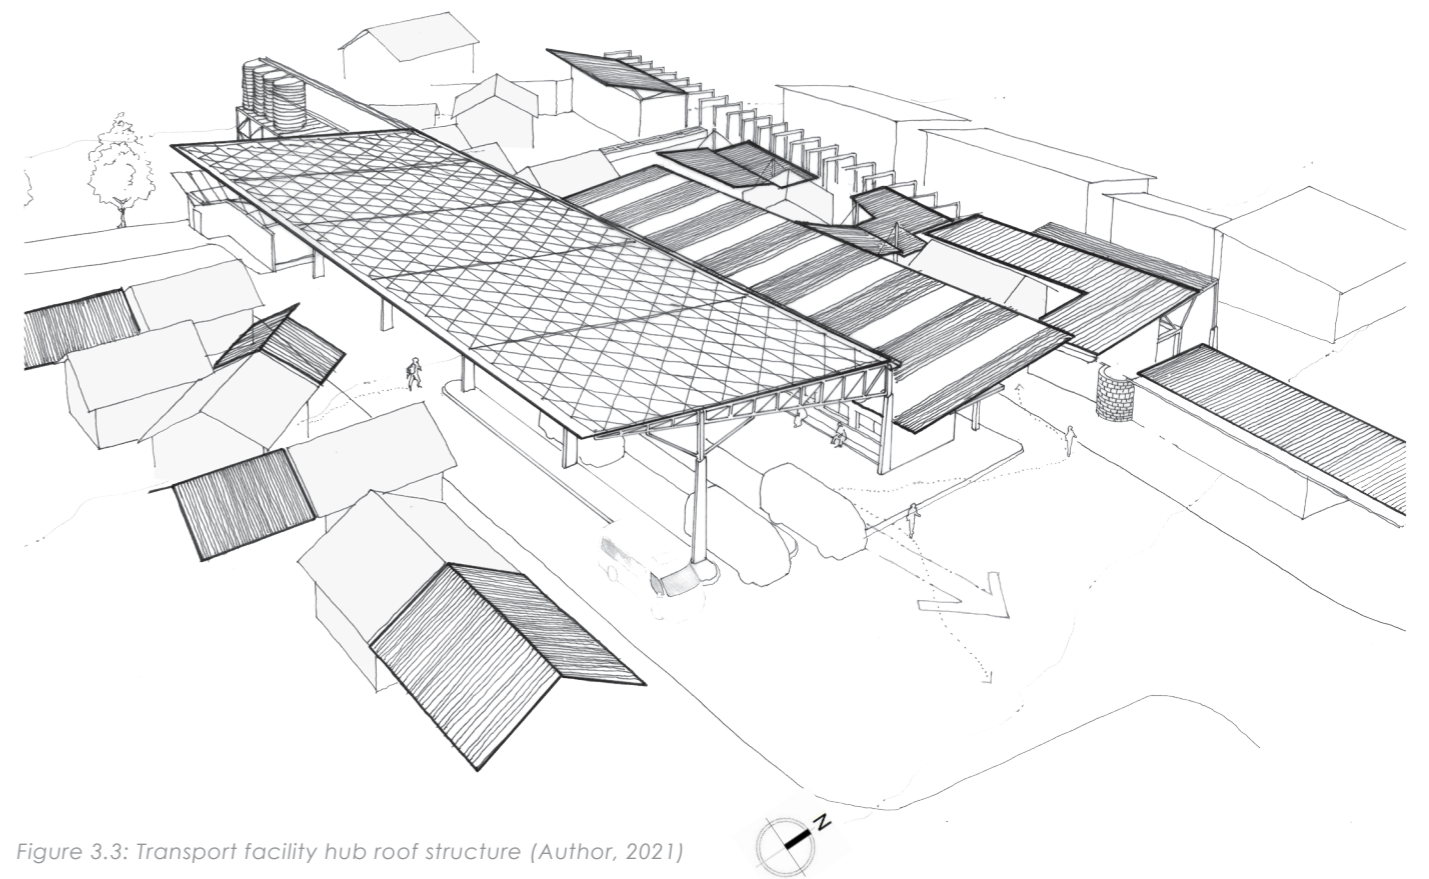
Transport facility hub roof structure (Author, 2021)
